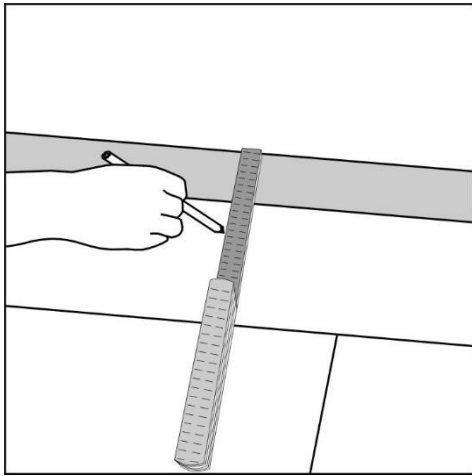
If the wall is uneven, the planks must be cut to match its contours. Mark the planks with the contour of the wall. Do not forget to leave a gap of 5/16" (8mm) to the wall. This procedure must also be used for the first row if necessary.
